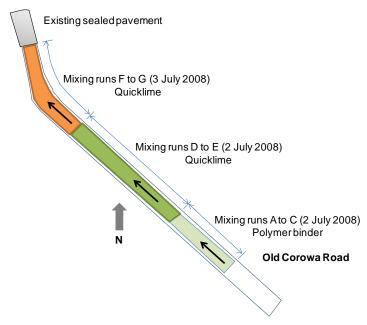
View of mixing runs for Old Corowa Road, Jerilderie.
